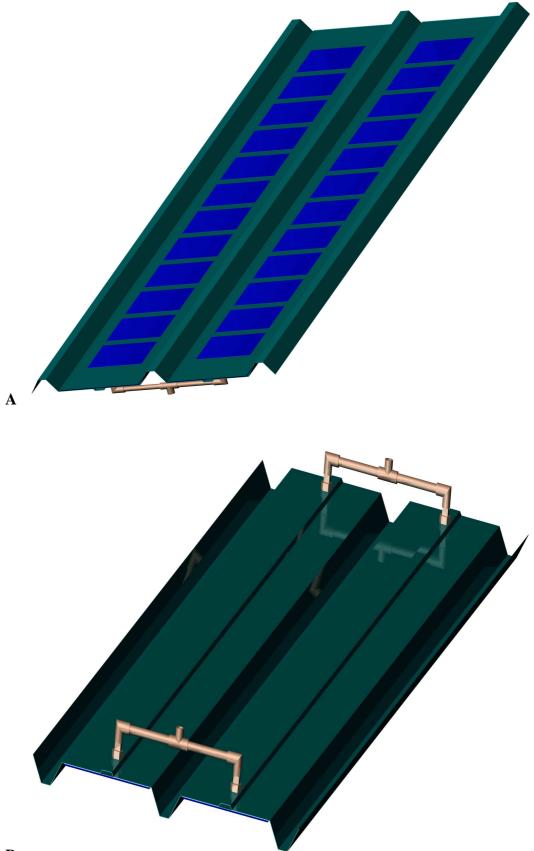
A) Front view and B) Underside view of an assembled BIPVT panel.
